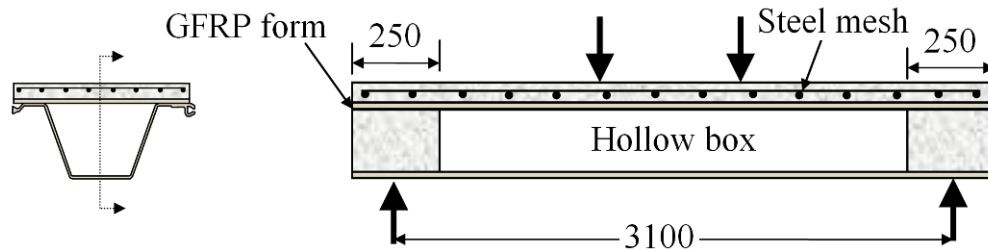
Corrugated GFRP SIP formwork acting as reinforcement for a concrete beam (after [79])
